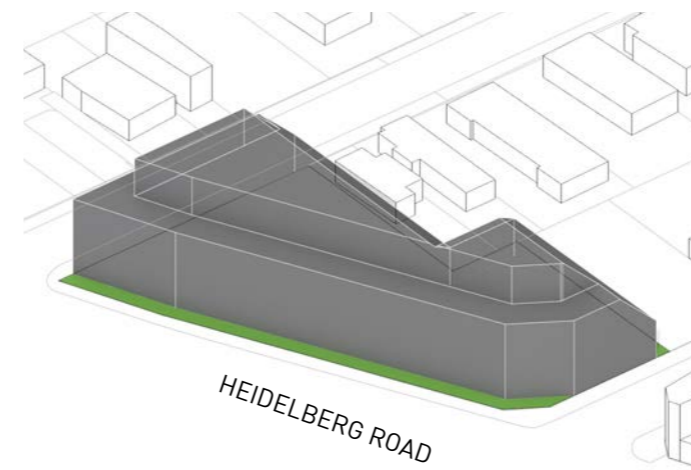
Demonstration of the 3d building envelope controls applied to the selected testing sites (refer over page)
